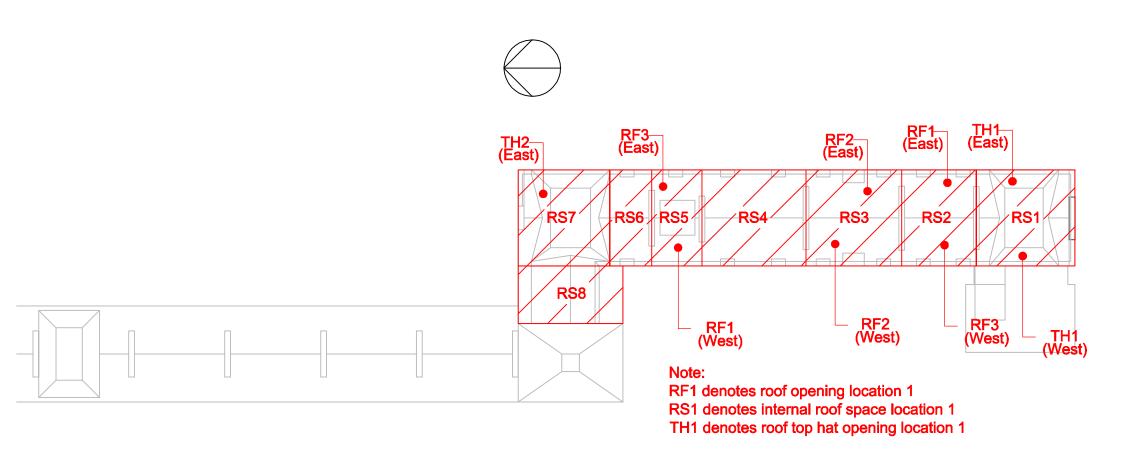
Plan of Station Hotel Building South Block showing Internal Survey Defect/Observation Locations of Roof Space and Roof Openings
